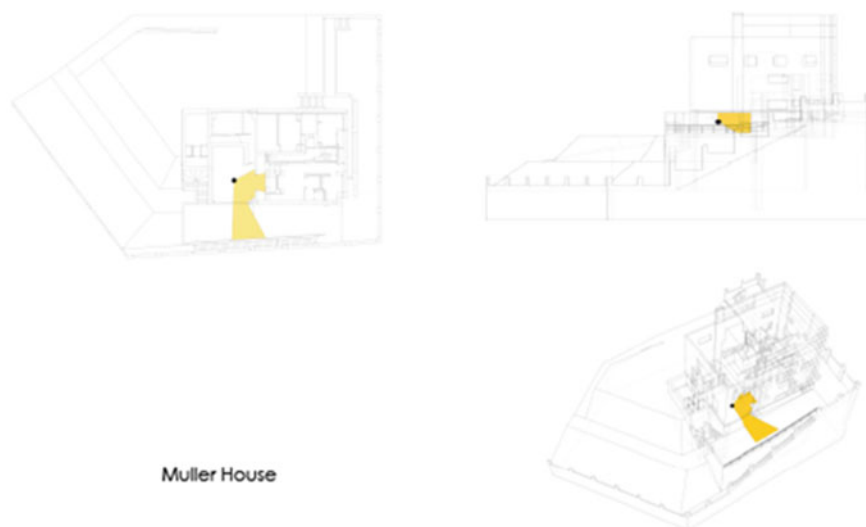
Adolf Loos. Müller House, (clockwise) isovists in plan, section and 3D
